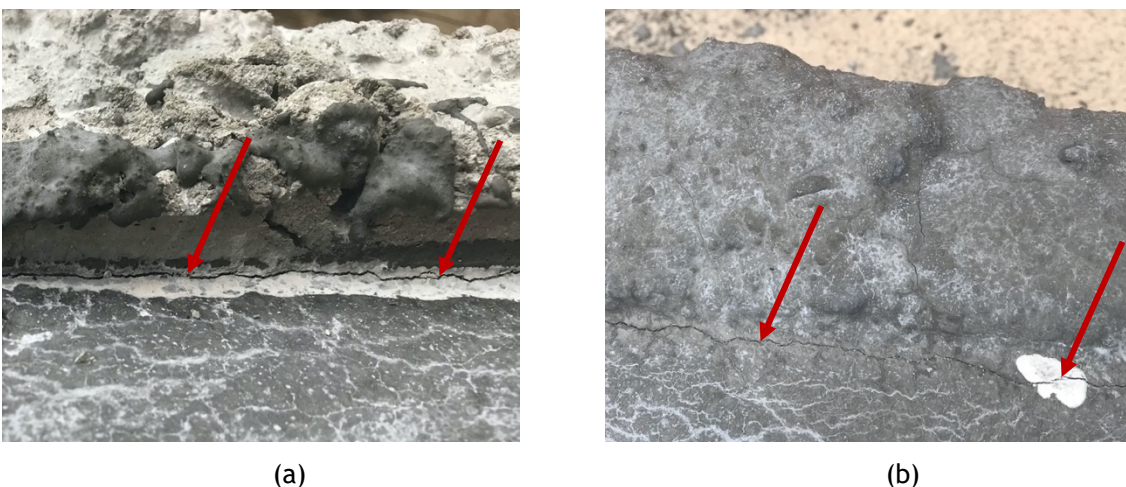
Typical 0.4mm cracks in common grout mock-ups: (a) crack in recessed grout area and (b) crack in grout spill-over area
